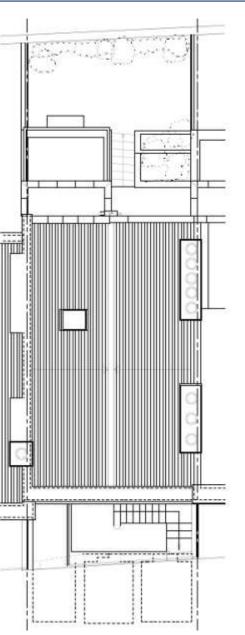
Plan of roof. This is a butterfly roof which is partly slated. One pitch has been recovered in felt.
